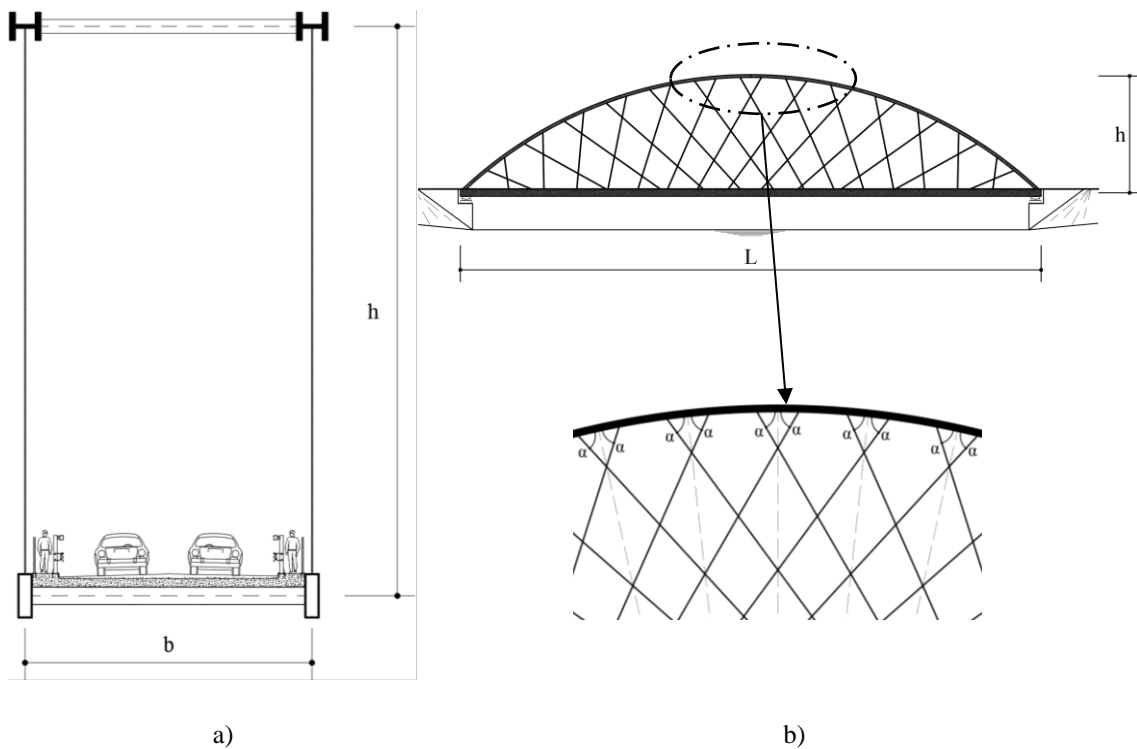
a) transversal section of the bridge, b) longitudinal view of the arch
